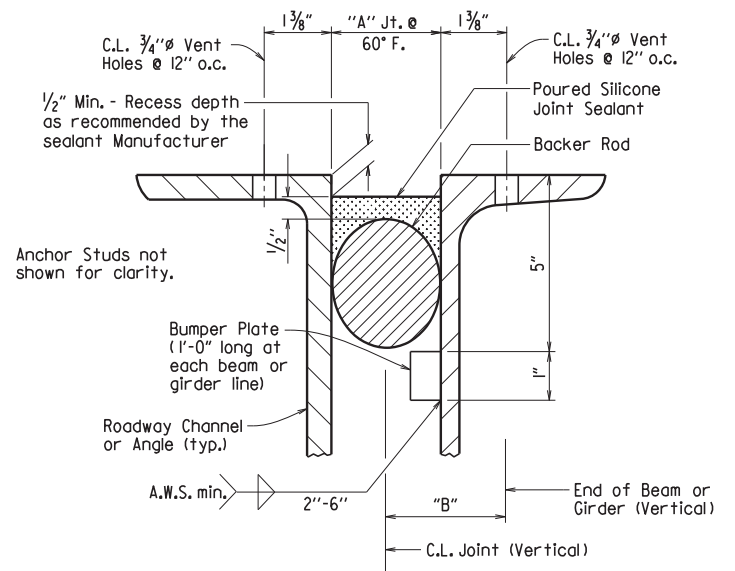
DETAILS FOR BLOCKING EXPANSION JOINT DEVICE
